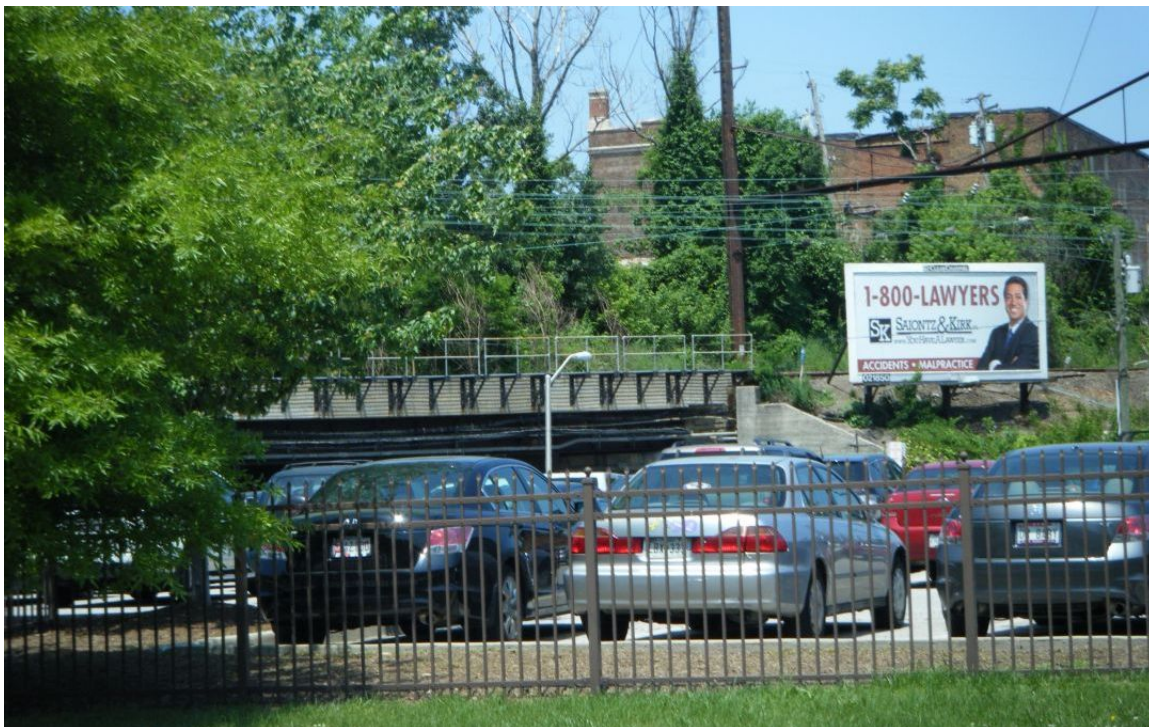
View northwest from the proposed eastbound at-grade alignment on West Mulberry Street toward the Baltimore & Potomac Railroad (including the contributing bridge over West Franklin Street); the proposed eastbound station platform is at the parking lot's southern edge (in the foreground)
